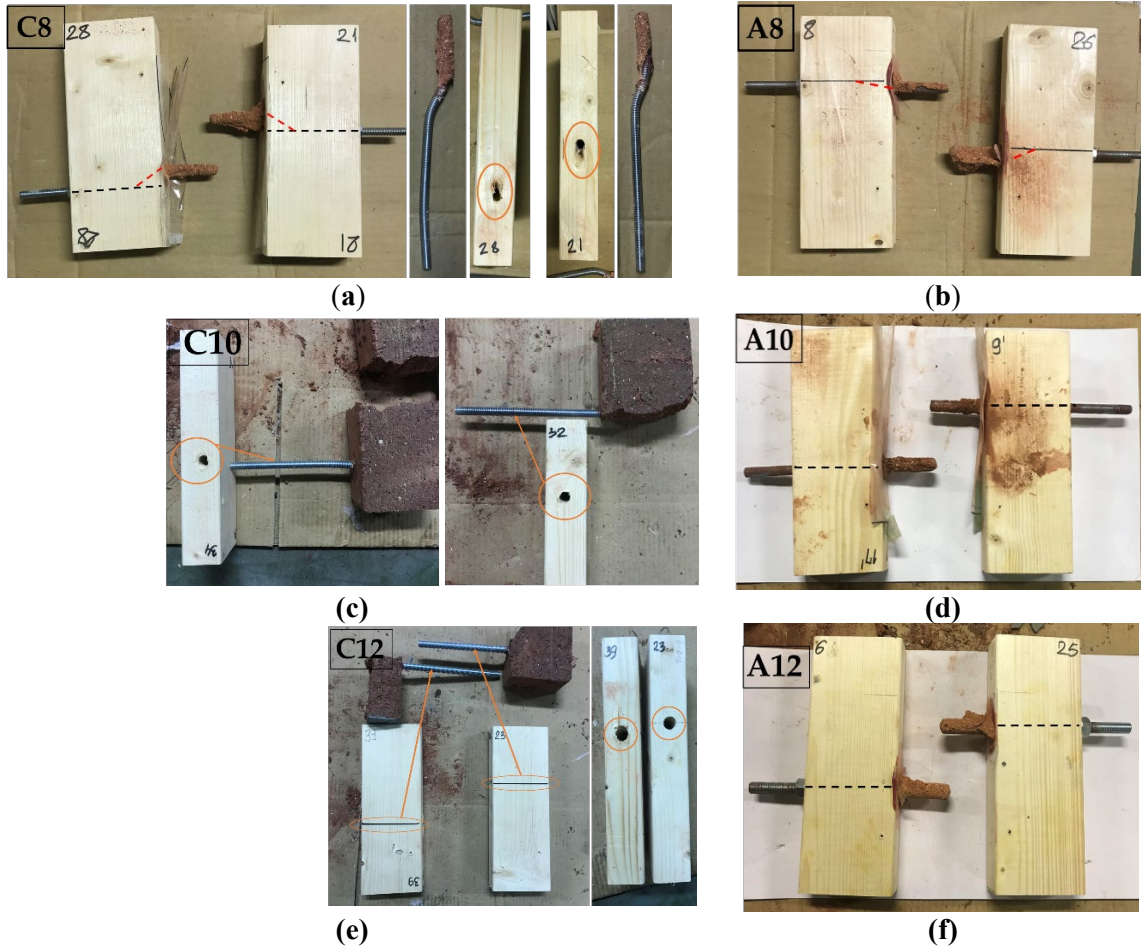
Deformation of bolt and hole of wood (side member). (a) C8-1 specimen; (b) A8-1 specimen; (c) C10-2 specimen; (d) A10-2 specimen; (e) C12-3 specimen; (f) A12-2 specimen.
